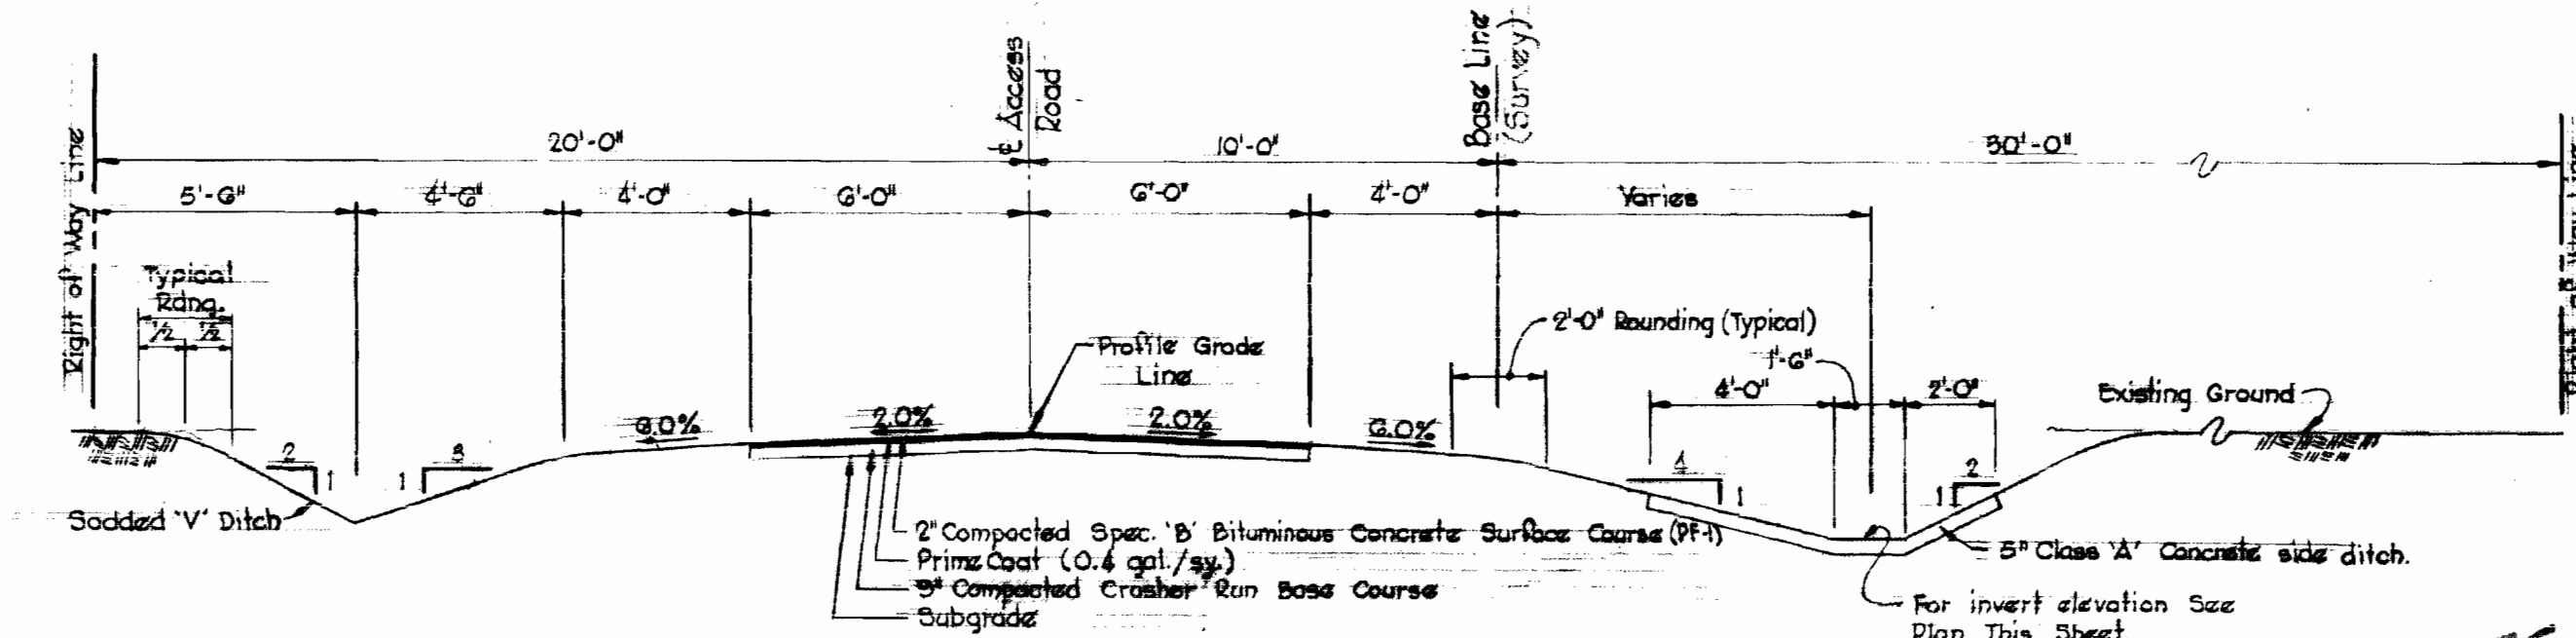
DETAIL FOR CONCRETE OUTLET DITCH ALONG EXISTING ROAD
